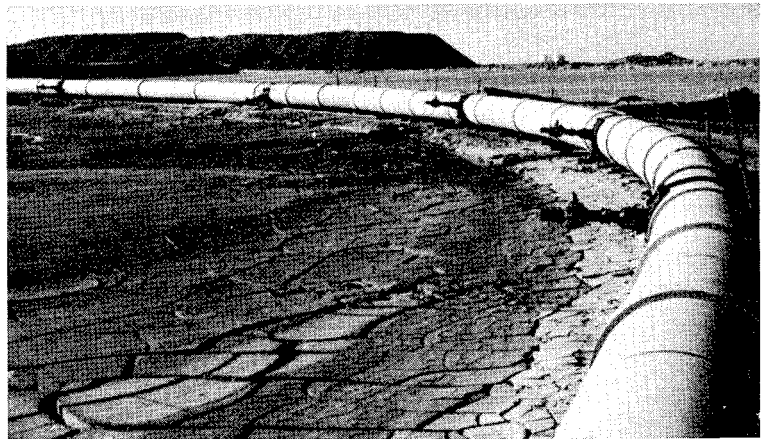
PHOTO C. TRANSITE HEADER PIPE WITH LATERALS USED IN DISTRIBUTING TAILINGS AT THE MISSION UNIT OF THE AMERICAN SMELTING AND REFINING COMPANY, ARIZONA.
